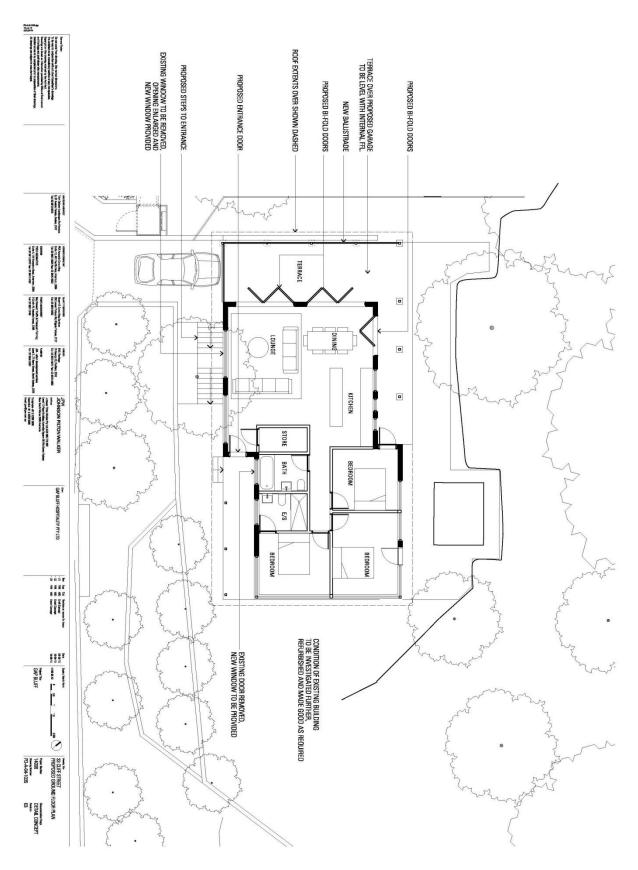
Proposed floor plan for the house at 33 Cliff Street. (Source: JPW 2015)
